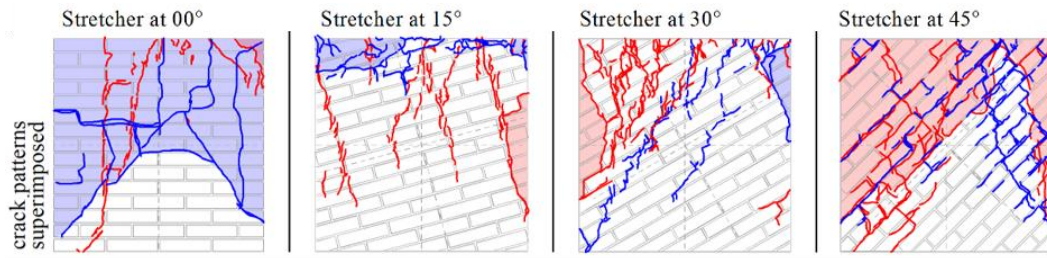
Crack patterns of the Stretcher wall elements shortly before failure.
